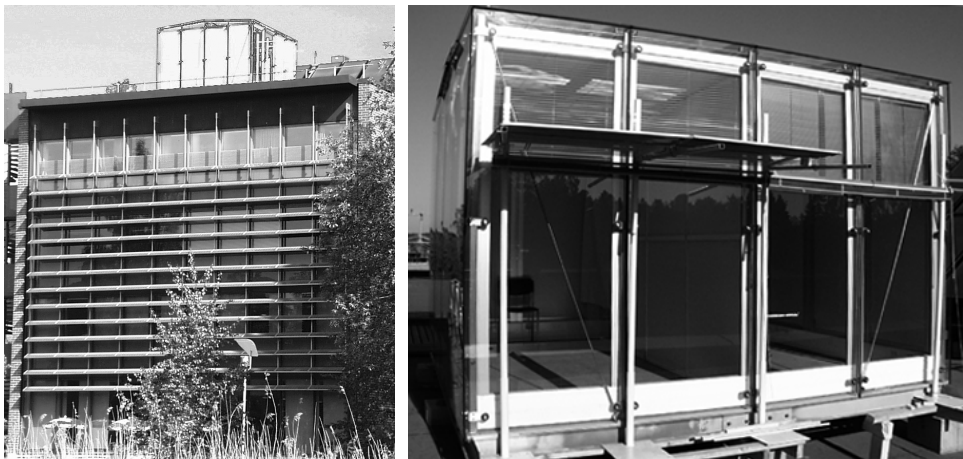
The south façade of "Light House" and the roof mounted "Glass Cube"
